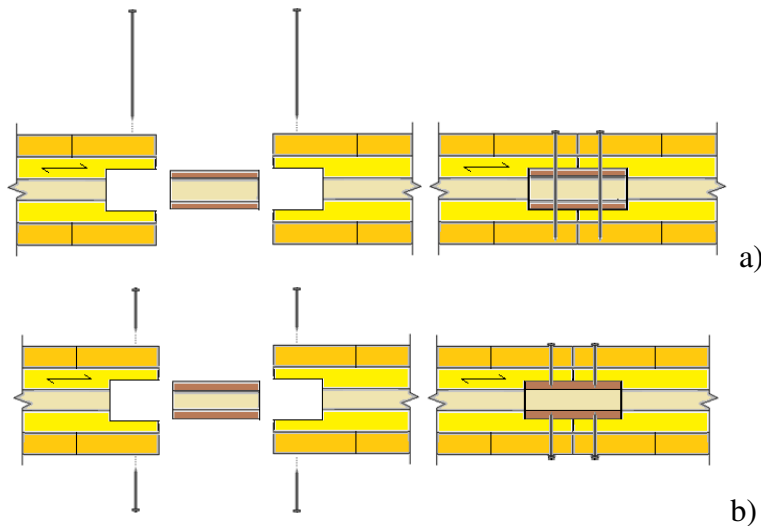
Internal SIP spline solution for aligned wall-to-wall or lateral floor-to-floor connection: a) with full-length fasteners (double shear planes); b) with partial length fasteners (single shear planes).
